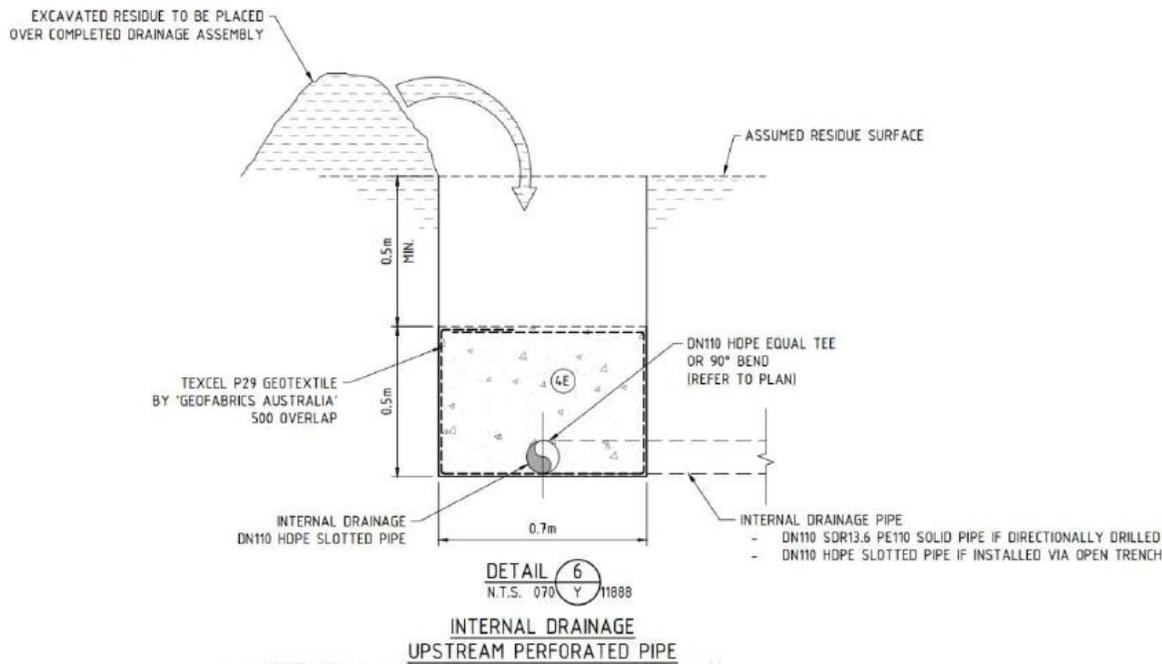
Connection of internal drainage connection pipes – BRDA 4 Stage 8
